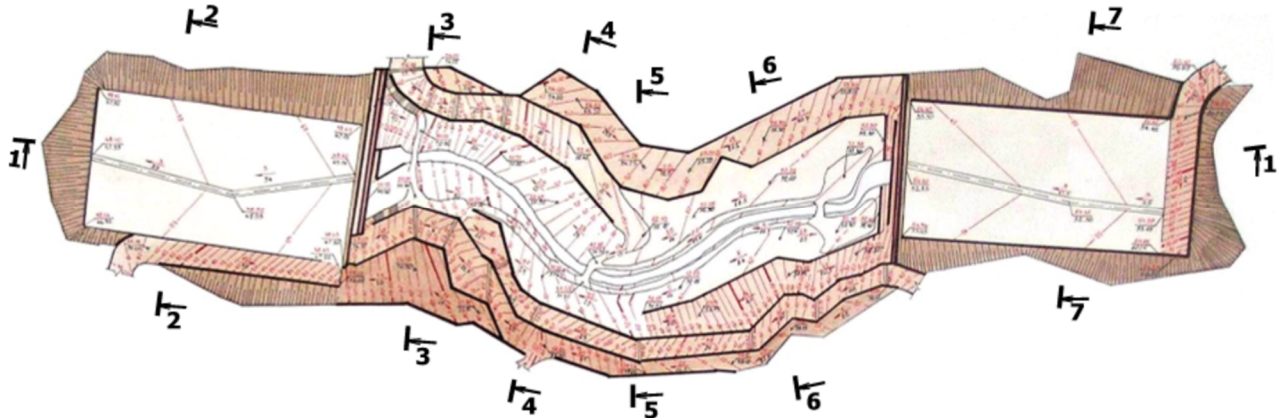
The plan of the retaining walls with a structural surface in the Sushkov beam.
